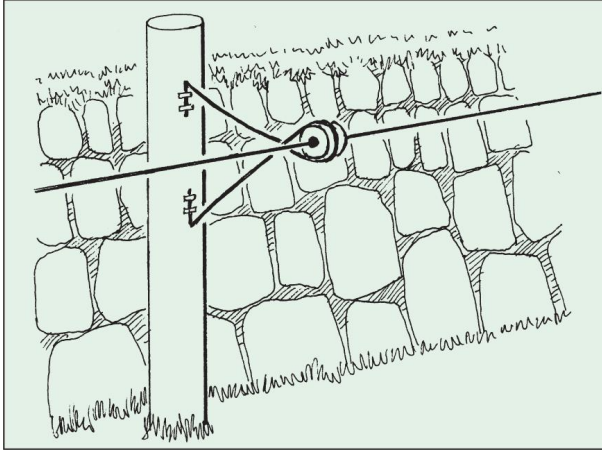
The hot line is a simple way to reinforce walls, hedges and fences. The line should be supported about 300mm from the wall.
